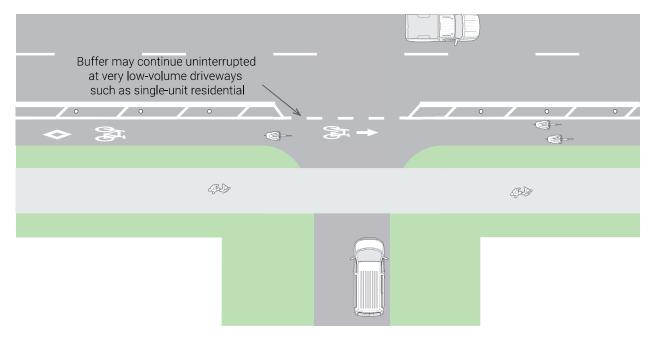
Low-Volume Driveway Treatment, On-road Facility
